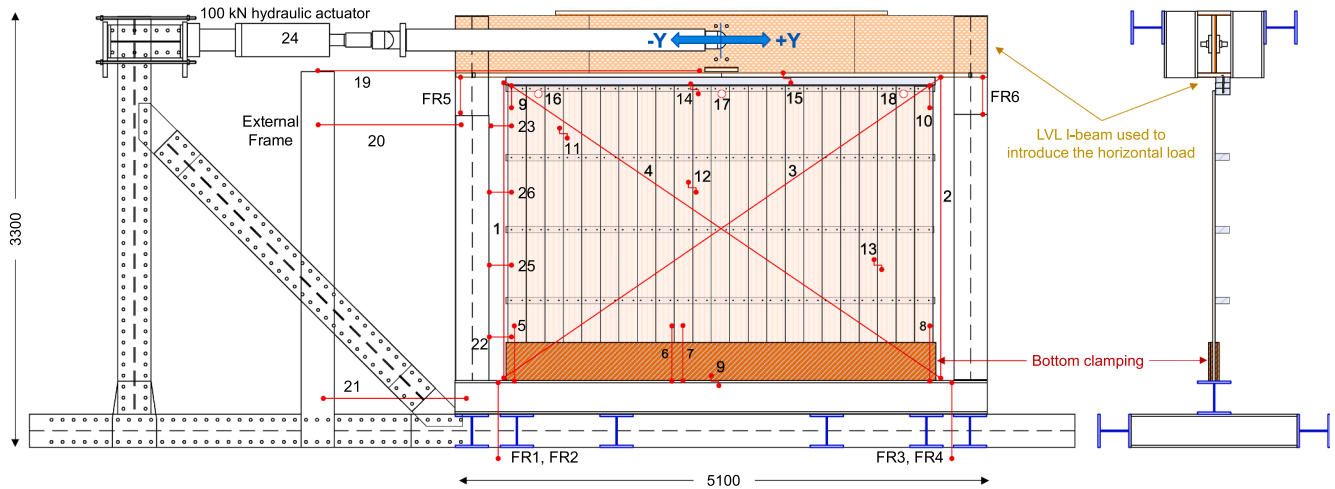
Front view and cross-section of the test setup; the position of the sensors is also shown.
